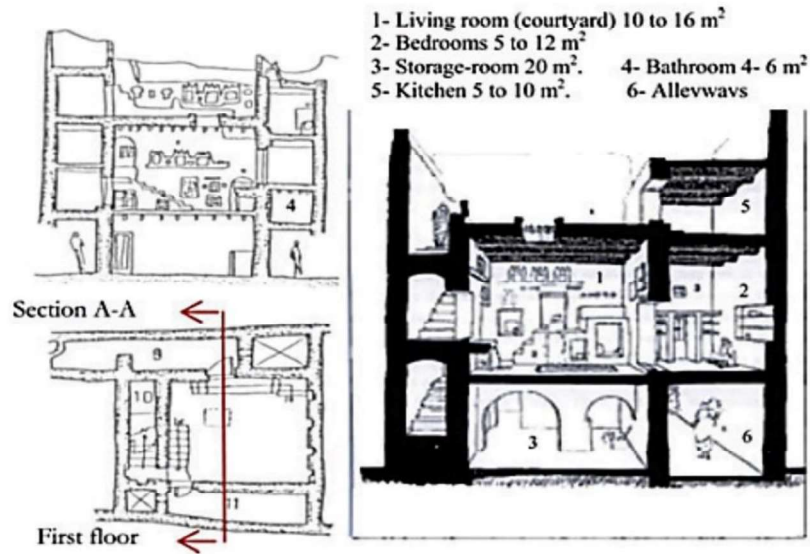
Plan and sections of the old house in Ghadames. (Shahran et al., 2017)
